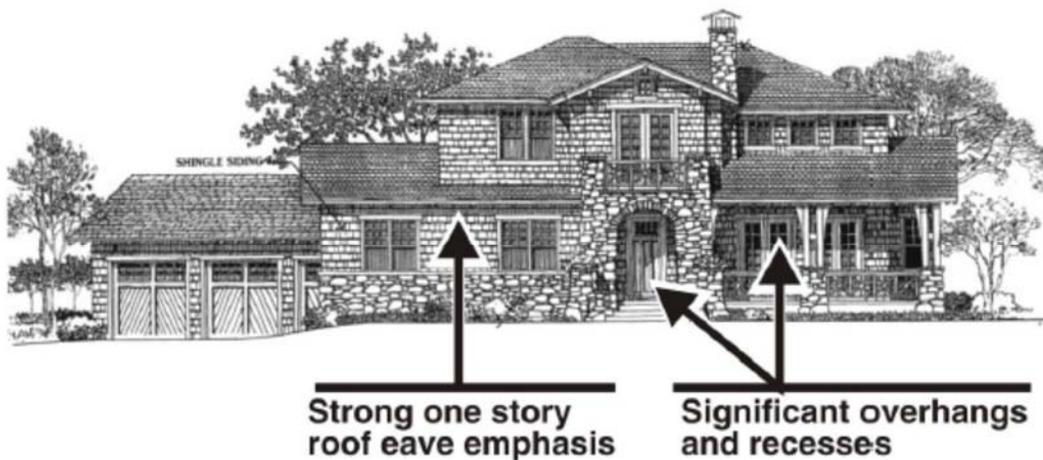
Design exhibits use of differing wall planes, two story entry element and covered porch to break up the front facade.
